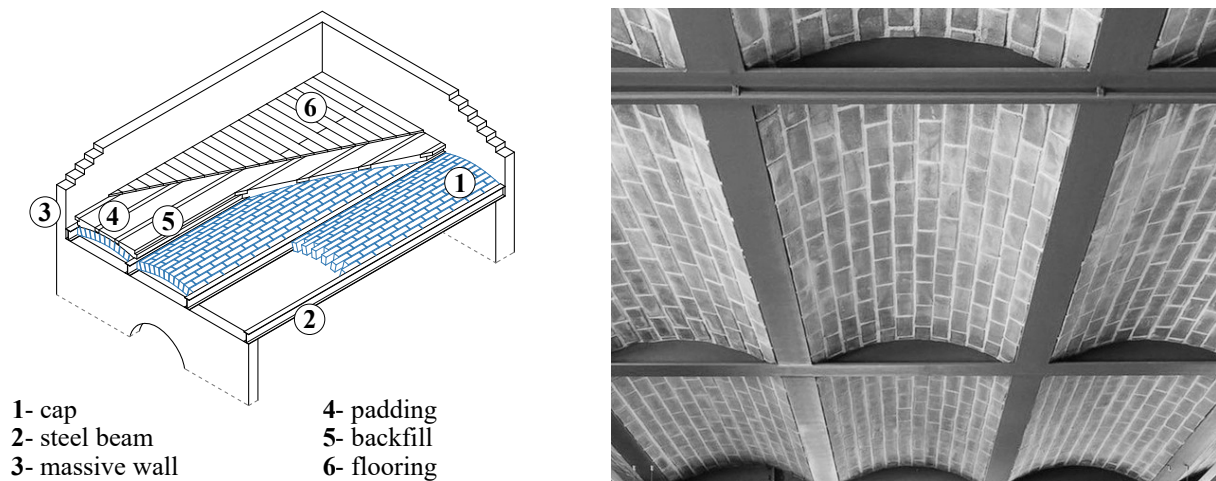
The historical cap ceiling. Left: Construction of the historical masonry ceiling between two steel beams. Massive walls are used as lateral shear supports, and in several historical cases, mineral waste material has been used as backfill [8]. Right: Interior perspective of a capped ceiling construction (photo by Francisco Nogueira, source: <https://franciskonogueira.com/antonio-costa-lima-junqueira/>, accessed: Jun. 27, 2024).
